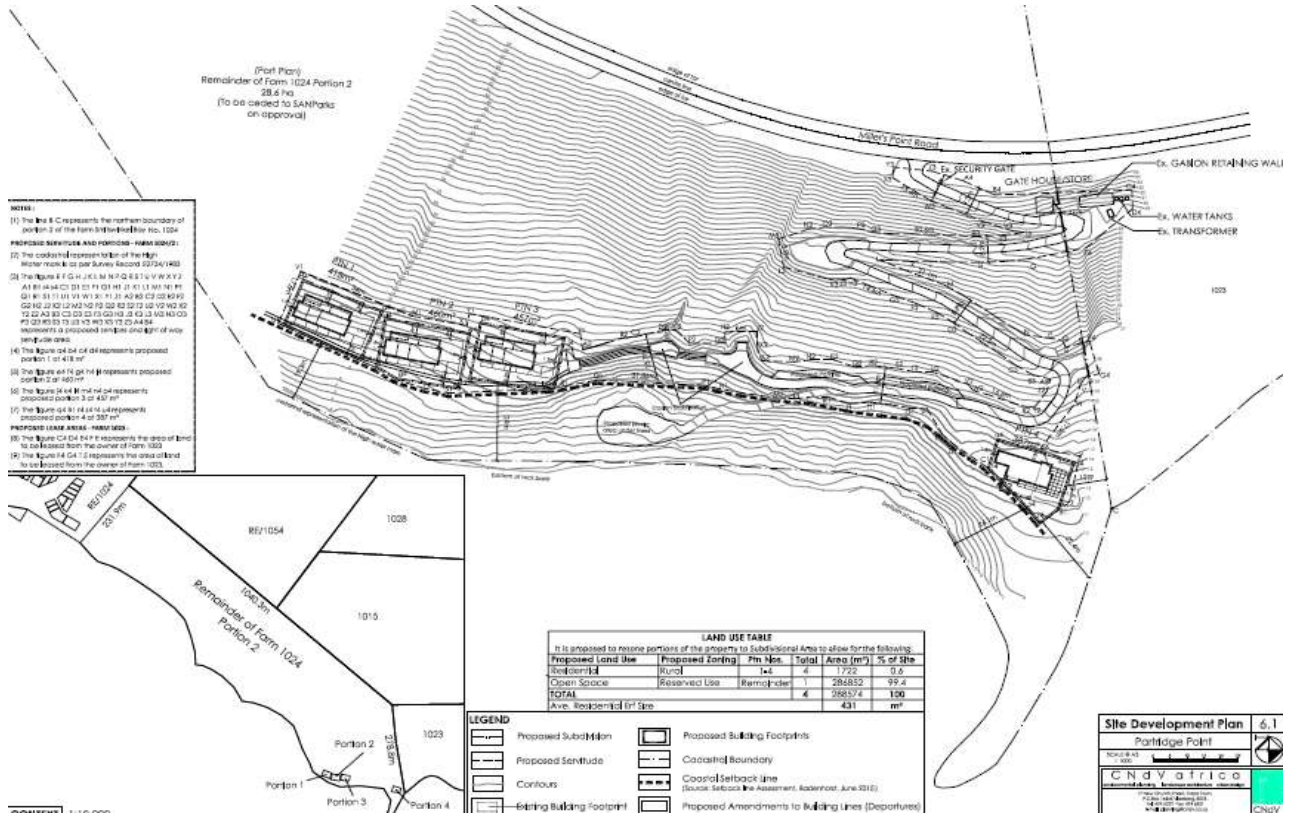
Site plan showing position of buildings on the site, picnic area and access route. Source CNDv
